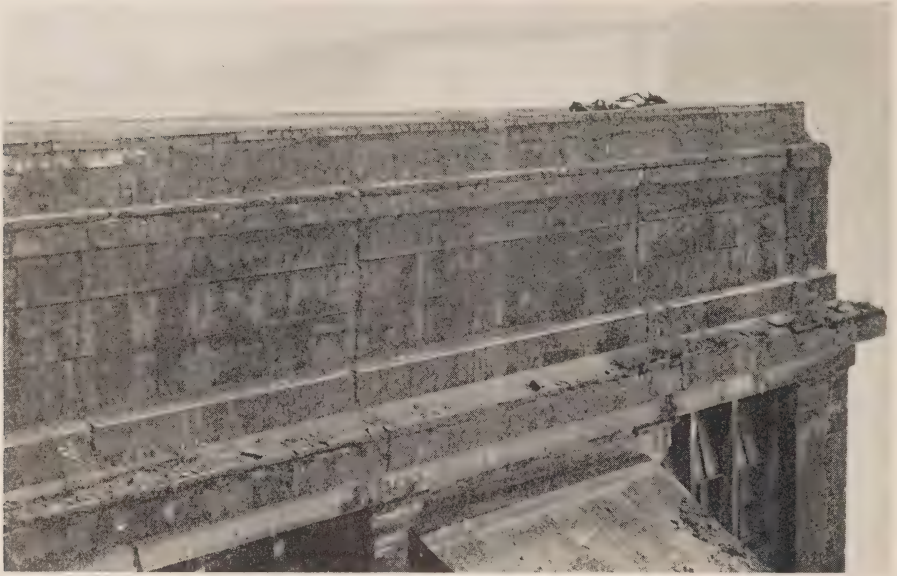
Face of section of building 25 years old. Note—While concrete looks rough, actual deterioration is small.
